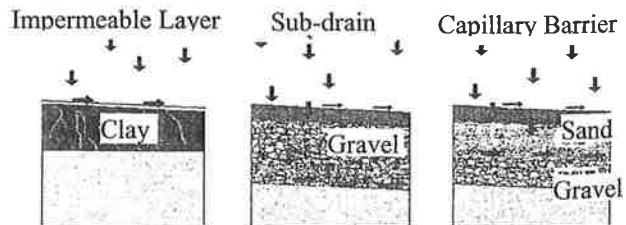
Impermeable layer, Sub-drain, Capillary Barrier
